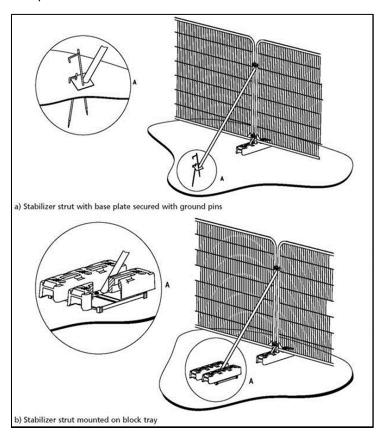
Tree protection fencing specification (extract from BS 5837: 2012)
